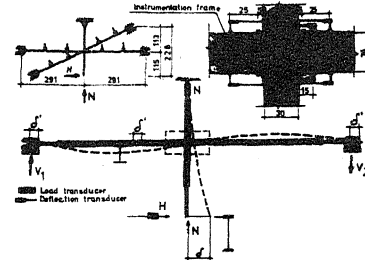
Schematic Representation Specimens Loading and Instrumentation
